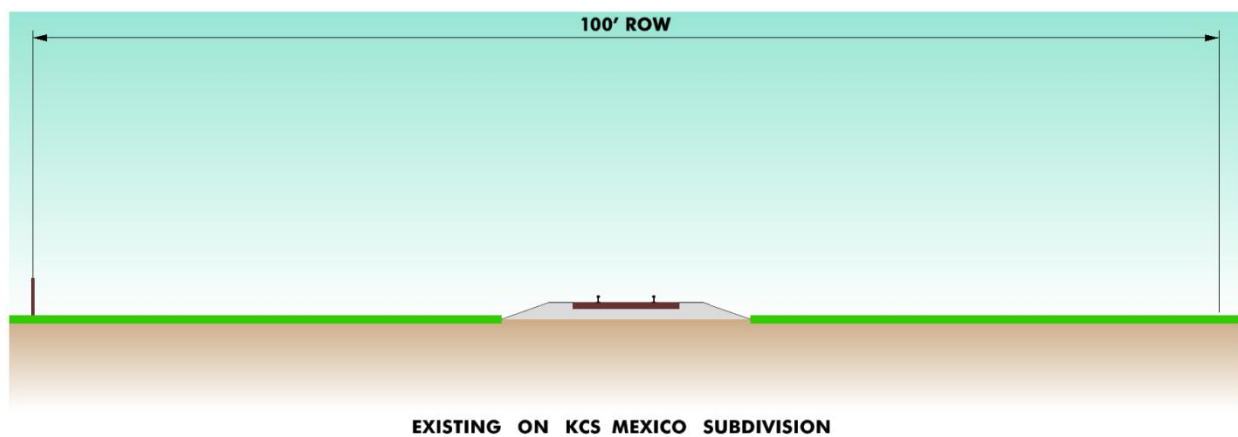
Regional Rail Typical Section KCS Railroad - Existing Conditions
